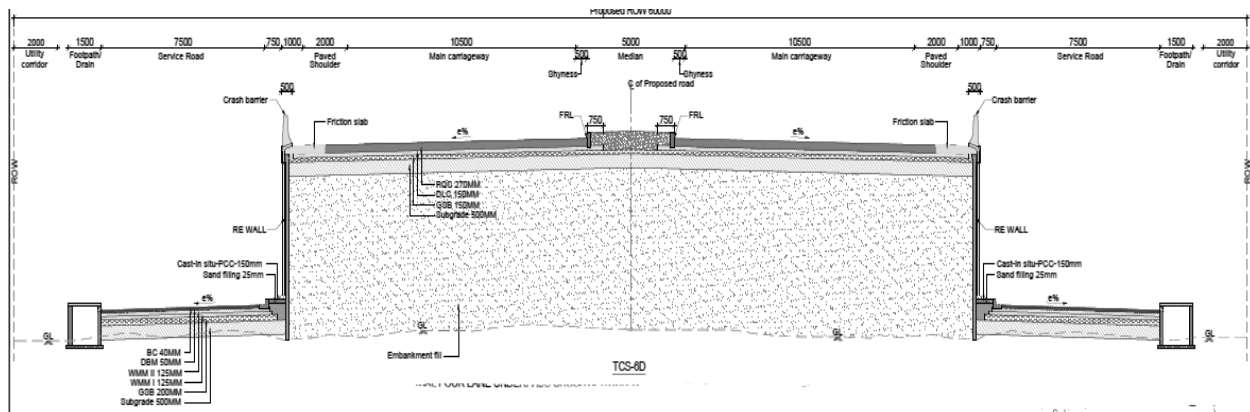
TCS-6D Typical Four Lane Underpass Cross Section with Service Roads in Bypass & Realignment
